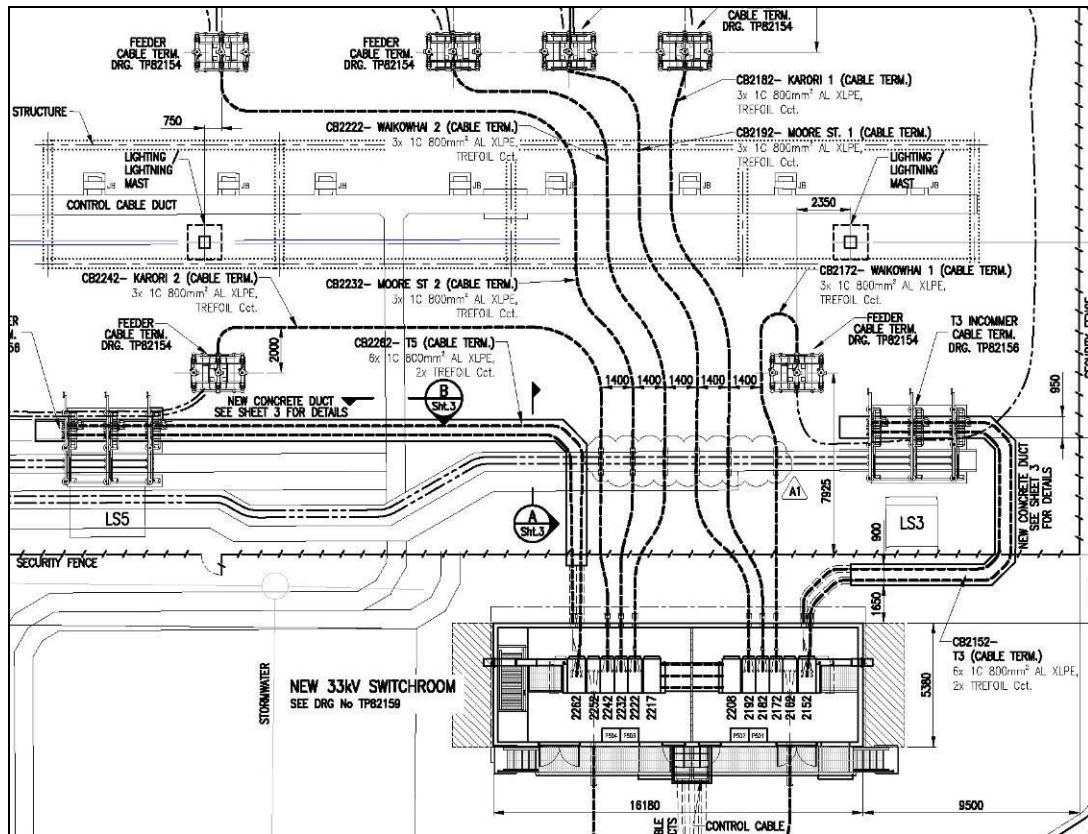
Preferred Switchroom Location and Cabling Arrangement
